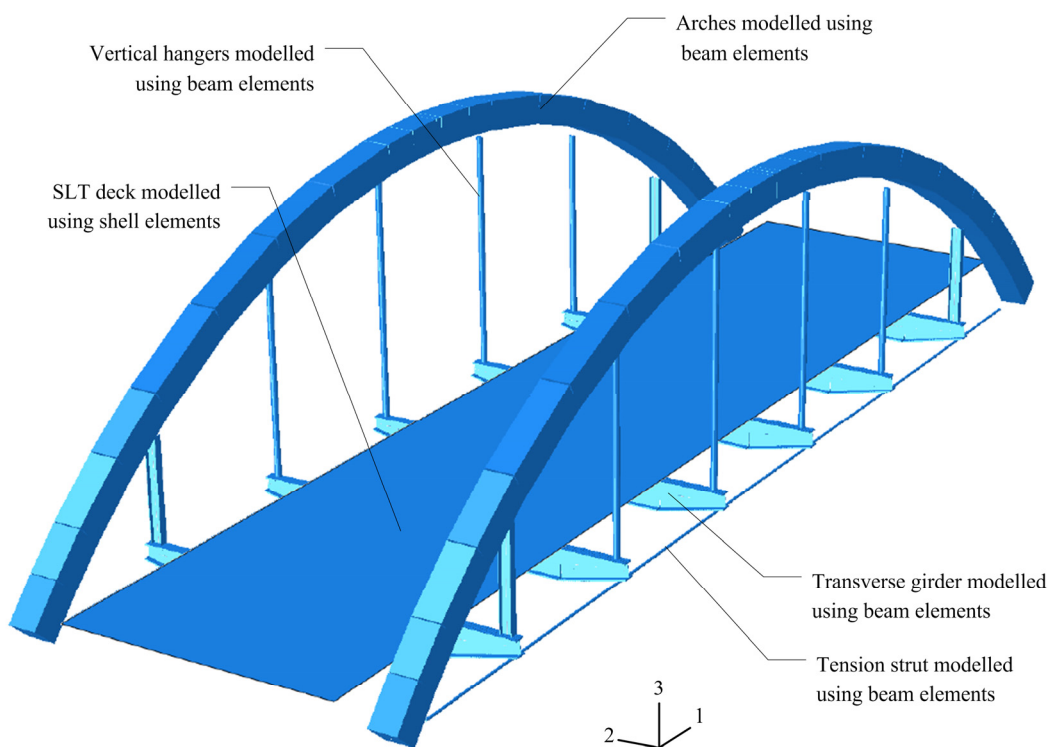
Numerical mode from Bridge-Plus. The parts of the bridge were modeled using beam or shell elements. All beam elements in the figure are rendered to show their correct profile. The coordinate system used is also shown.
